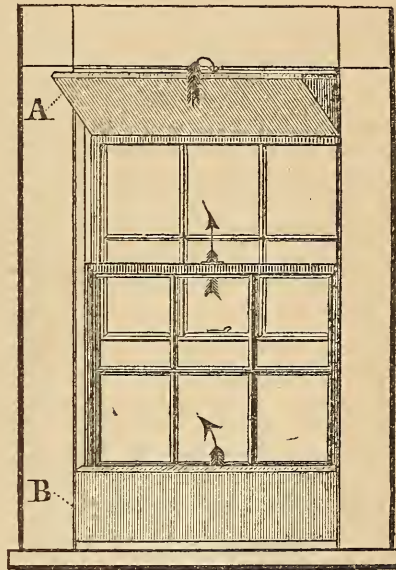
Ventilating boards, so arranged that the air is turned directly upward.
